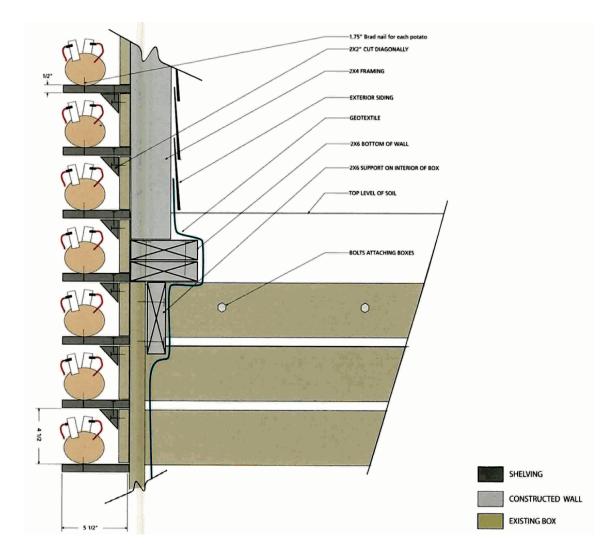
A cross-sectional detail view that shows how each potato is held in place by a braided nail. This plan also indicates the top level of soil outside of the exterior wall. (Plan by Iarocci, Ironside and Ross, 2007, used with written permission of Reford Gardens).
